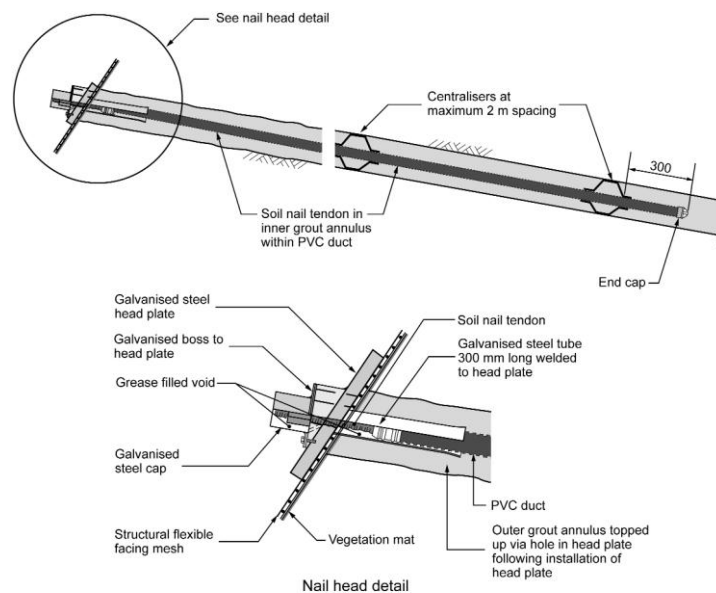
3: 120-year-design-life drilled and grouted soil nail with flexible facing.
